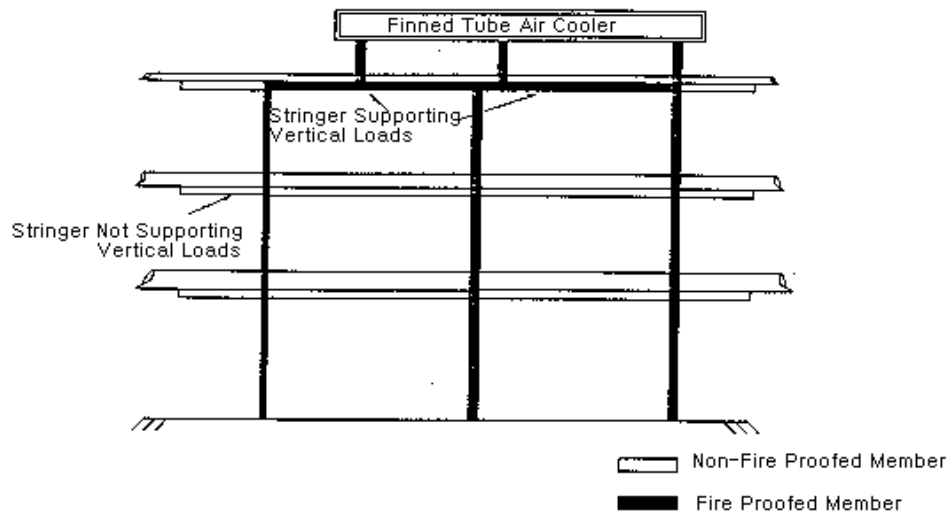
, Pipe Rack Supporting Finned Tube Air Cooler (Side View)
